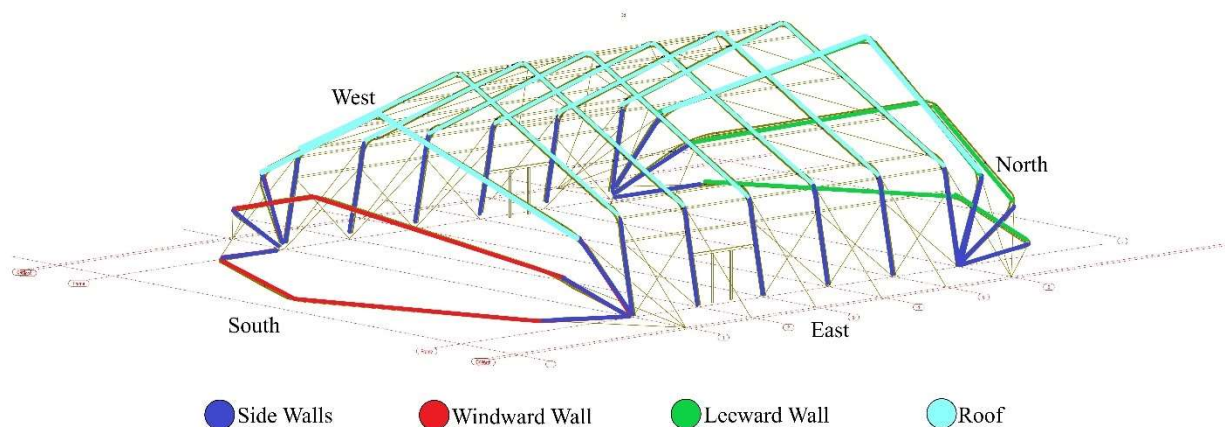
Layout of the first alternative longitudinal wind load case
